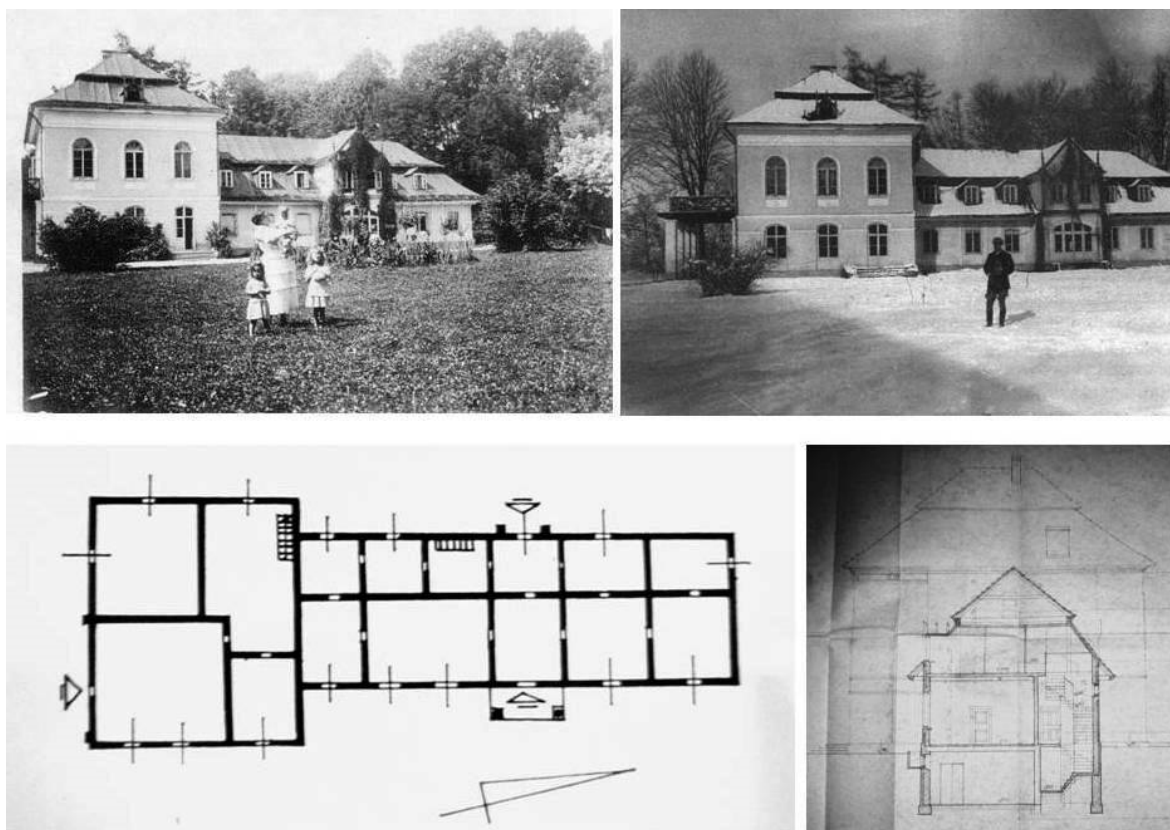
Sieciechowice. Manor house, as of 1924 [7], [1]; Plan and cross-section of the building [6]
